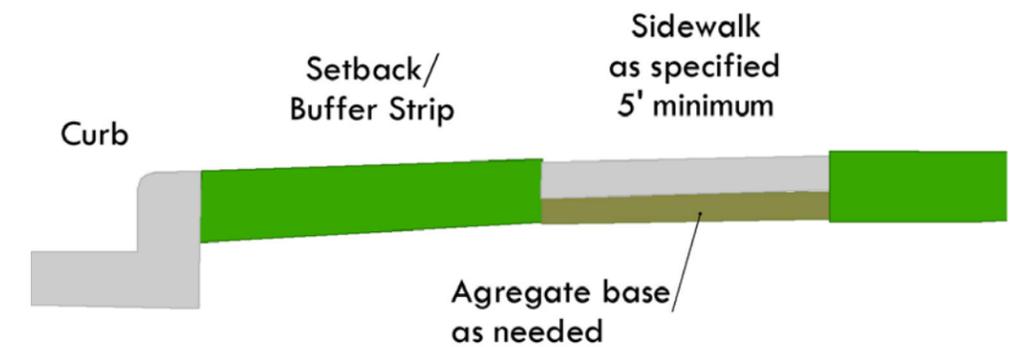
Example of typical sidewalk cross-section (Source: Oregon DOT)
